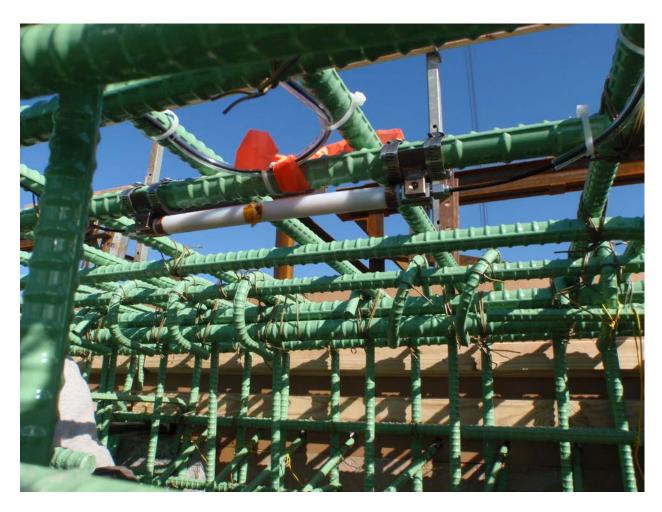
Photograph showing strain sensor installed at top of edge girder
